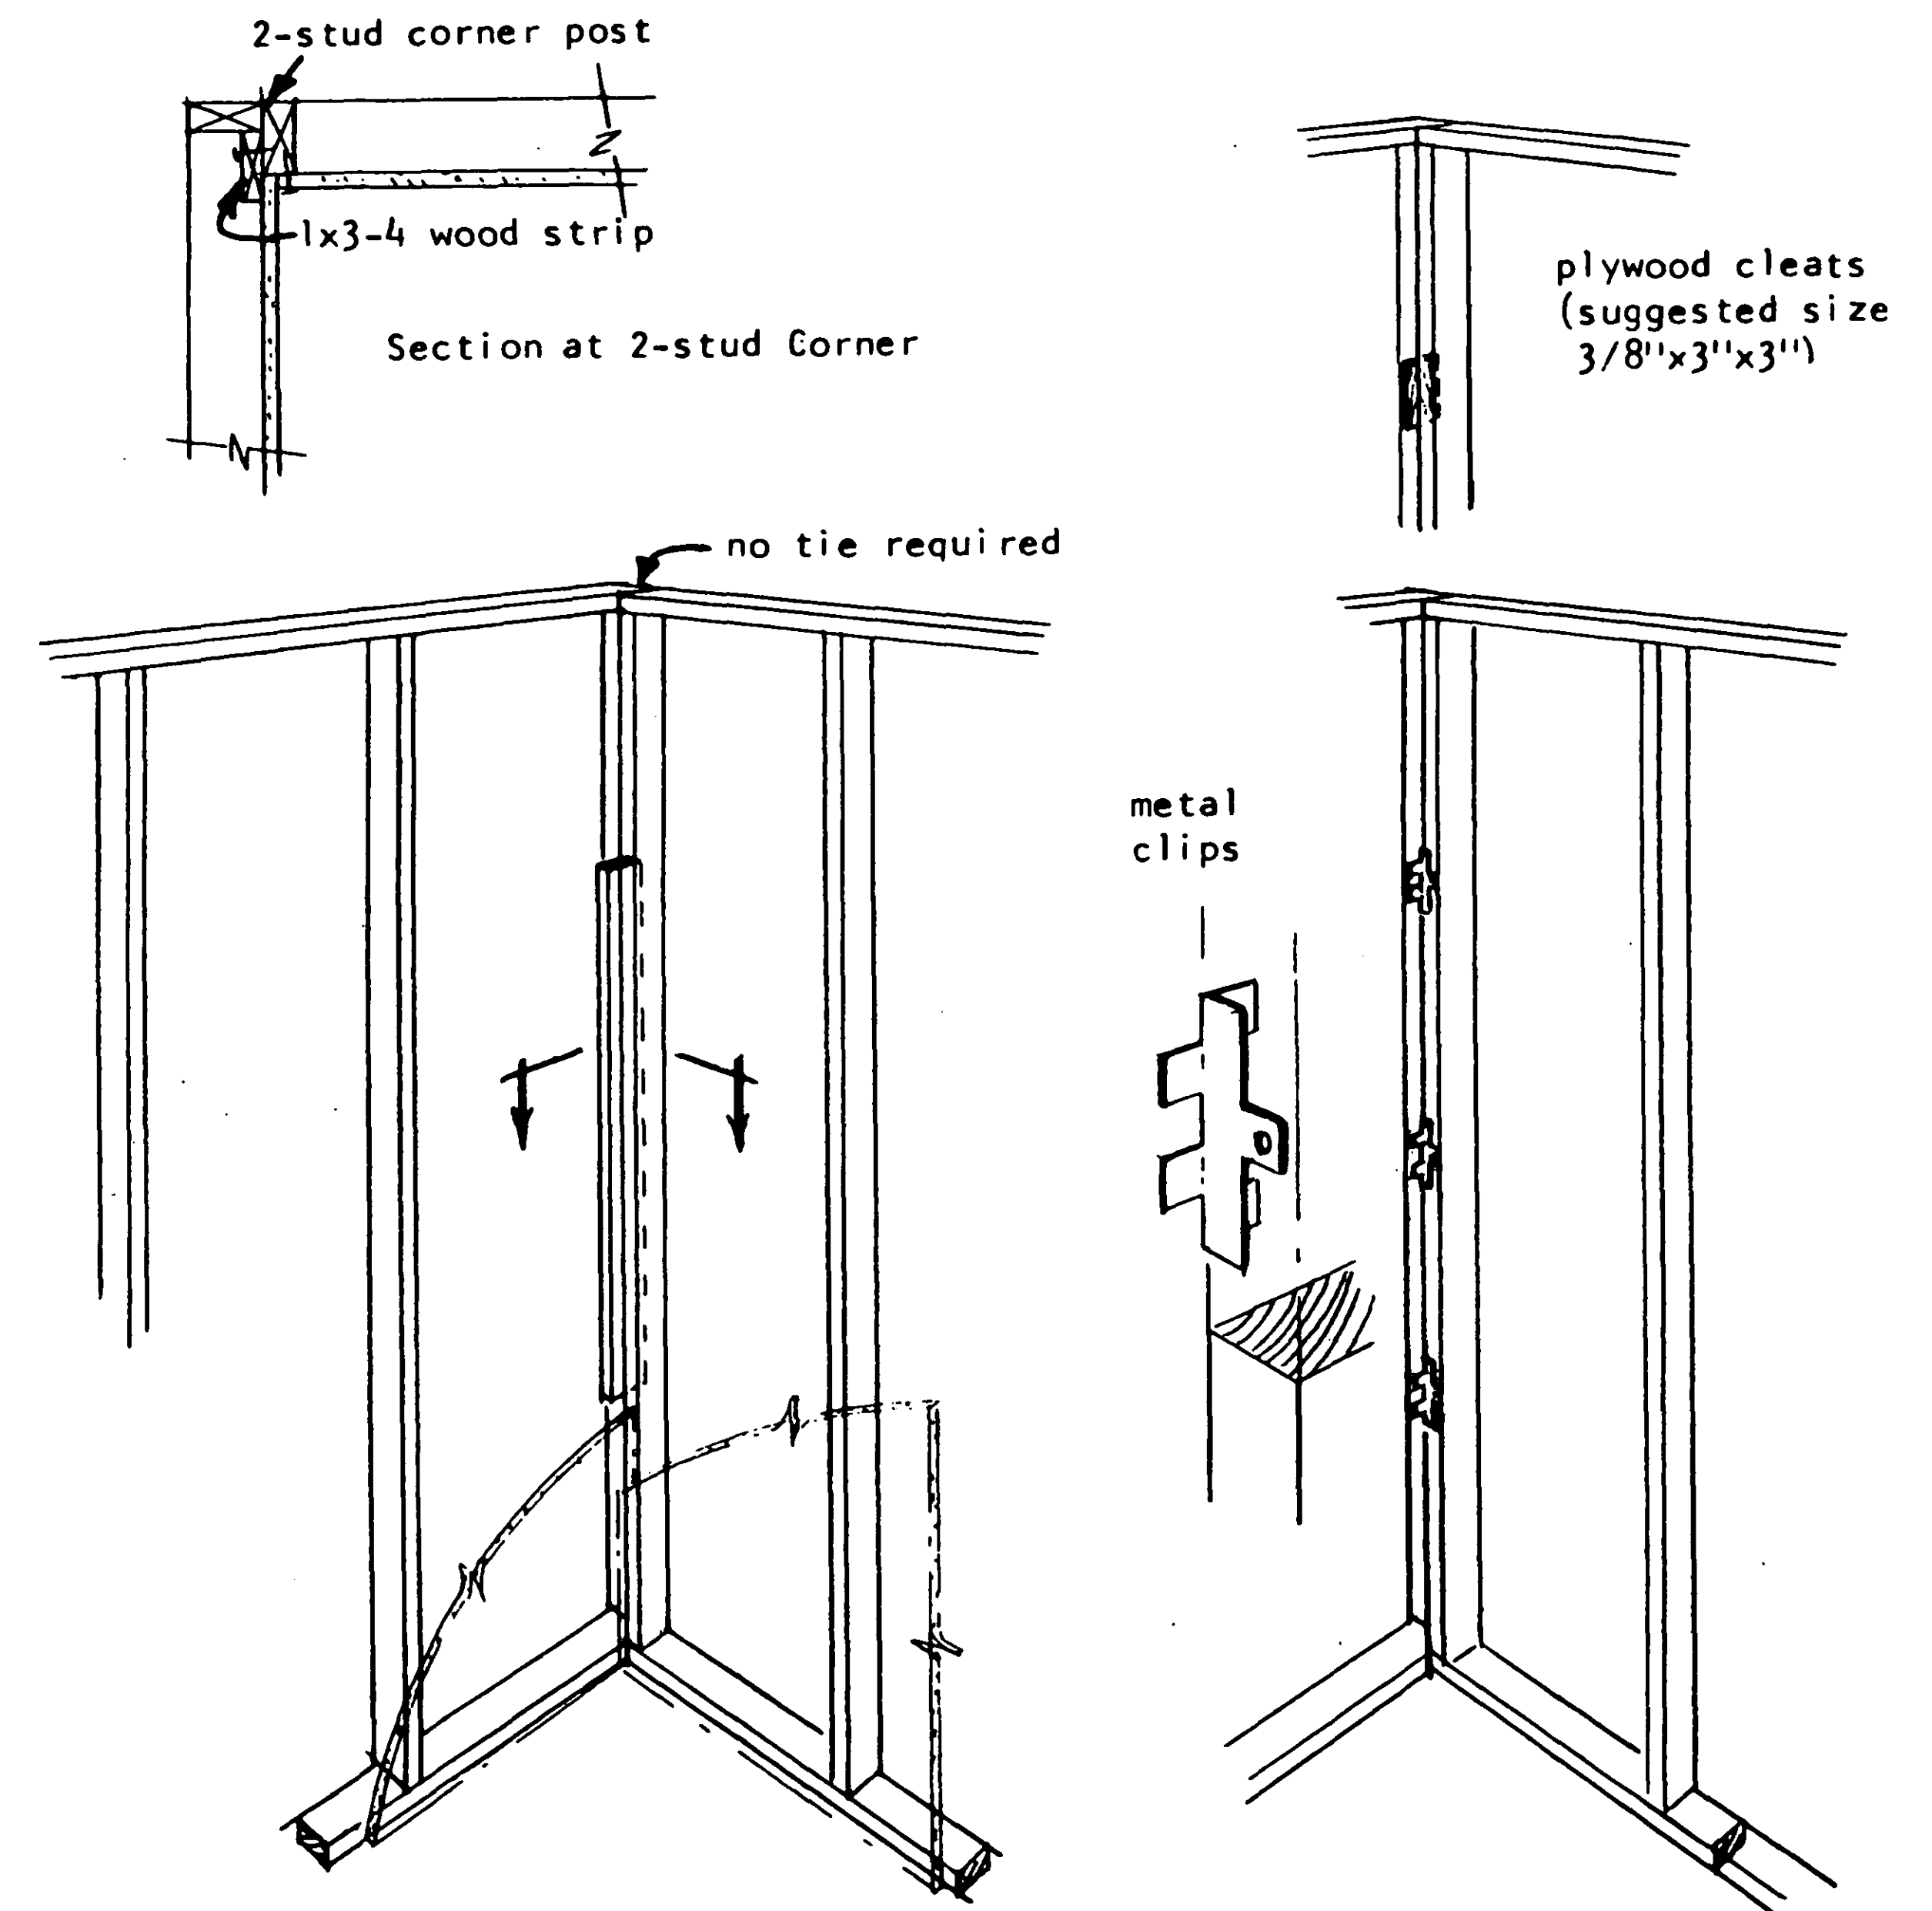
B. Alternate methods for providing drywall back up with a 2-stud "corner post"
